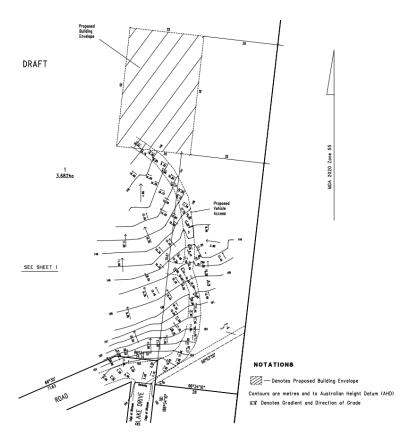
Enlargement of the Building Envelope and Driveway to Lot 1
